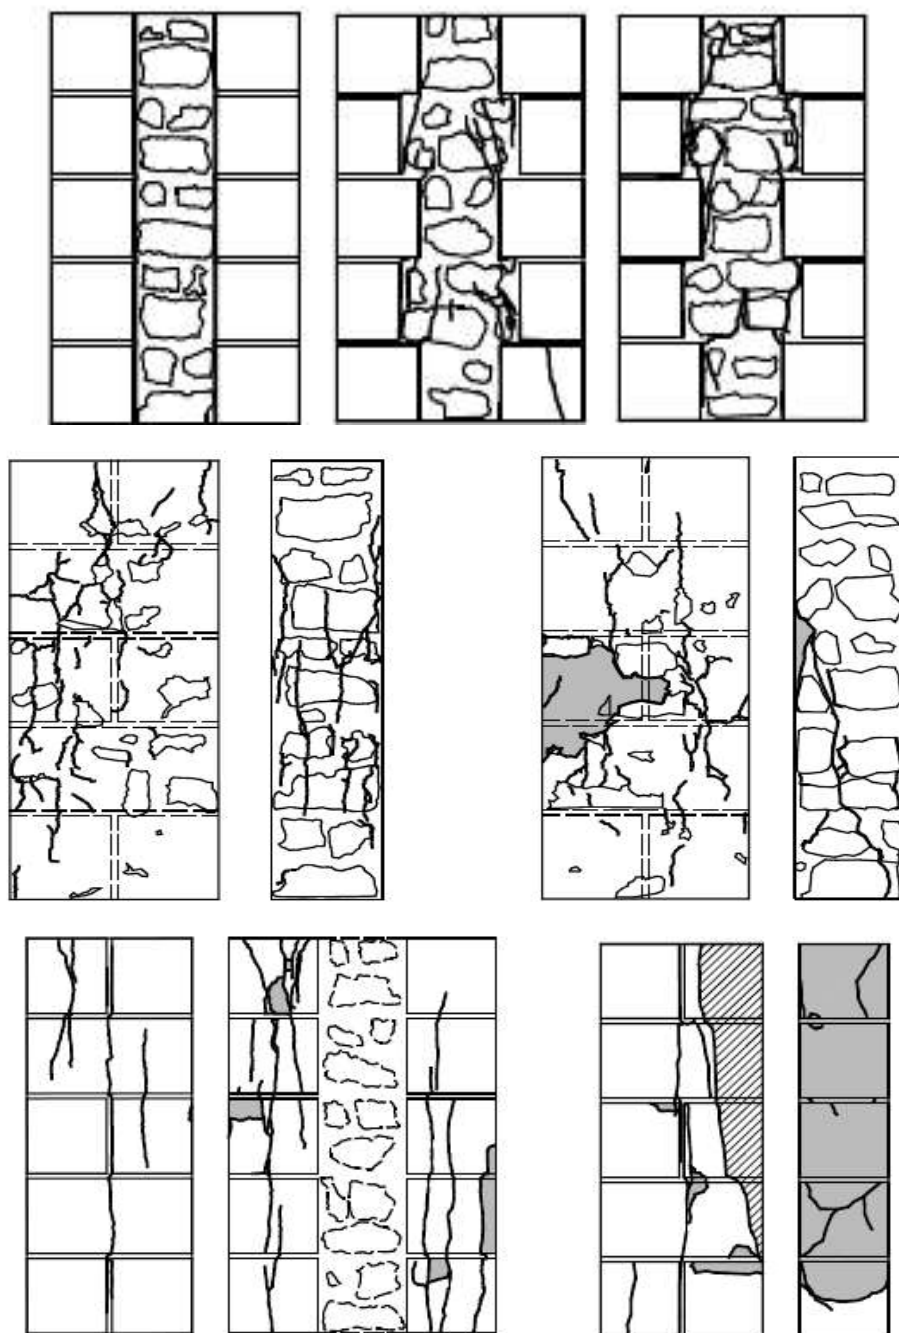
typical failure mode of three- leaf masonry in compression.
